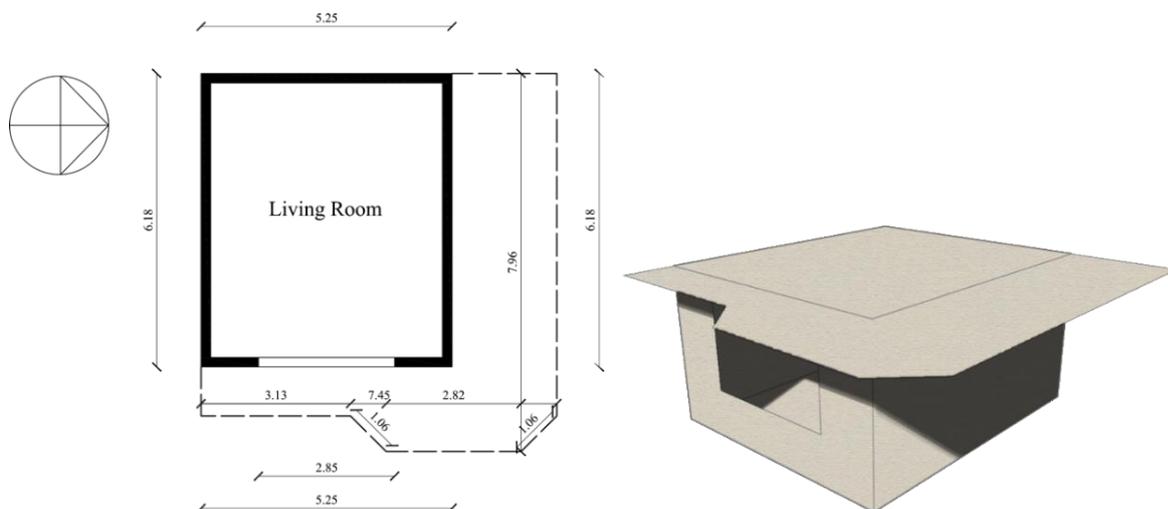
Living Room Plan and 3D Schematic without Rawshan
